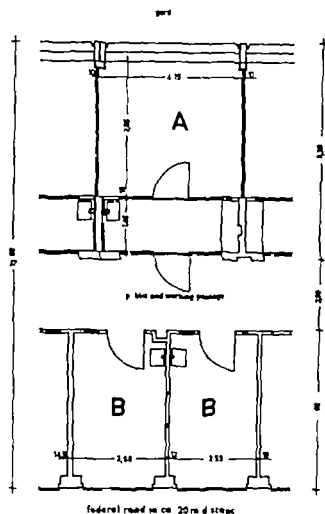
Children's unit (A) Rooms faced to garden with sluce Walls Wood artificial stone glass floor Spokhol ceiling plaster (B) Rooms faced to federal road Walls brick stones floor Spokhol ceiling plaster
